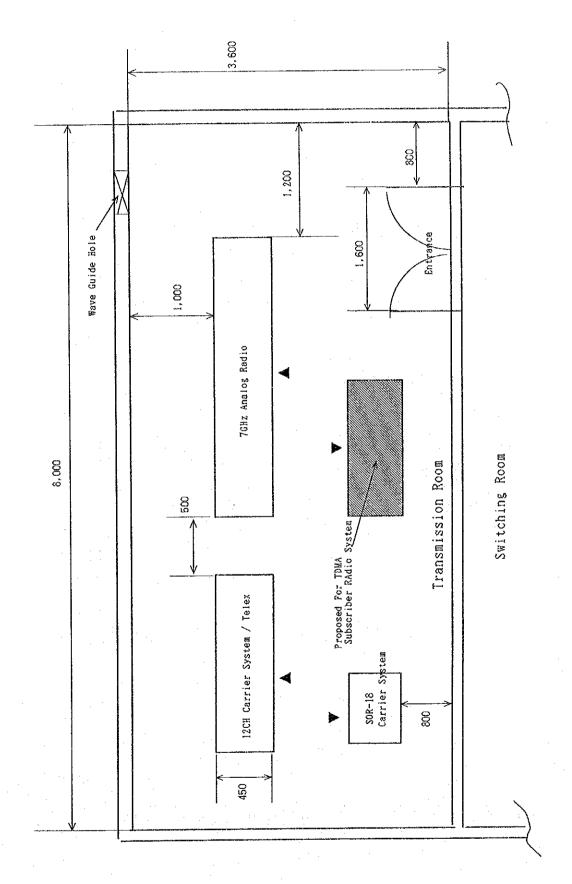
Equipment Layout Plan for PIGGS PEAK Exchange Office
